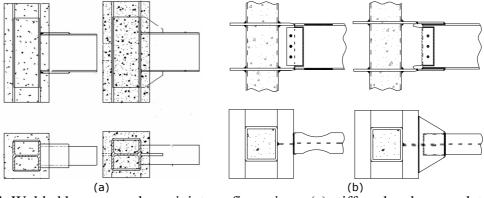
Welded beam-to-column joint configurations: (a) stiffened and cover plate joints with fully-encased wide-flange columns (Univ. Ljubljana), (b) reduced beam section and cover plate joints with CFT RHS columns (Univ. Timisoara)
